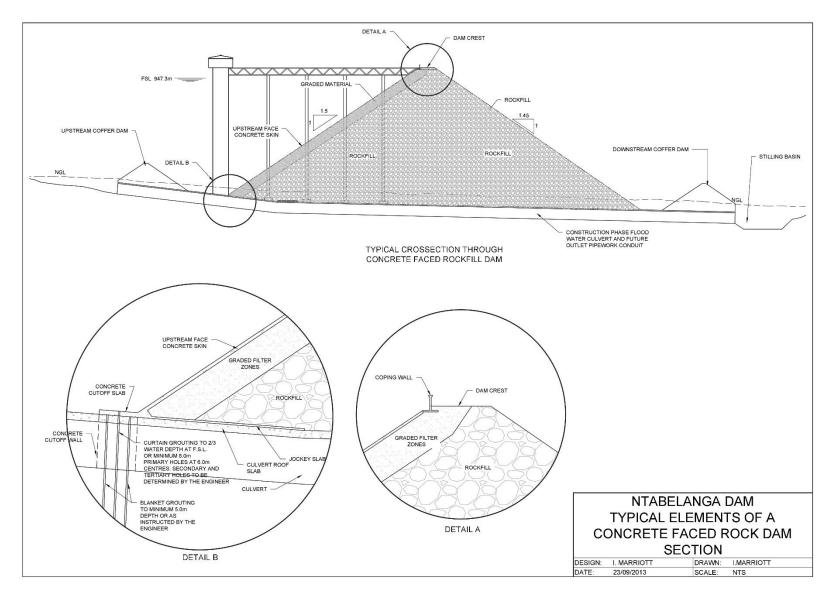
Typical Sections and Details for CFRD Type Dam
